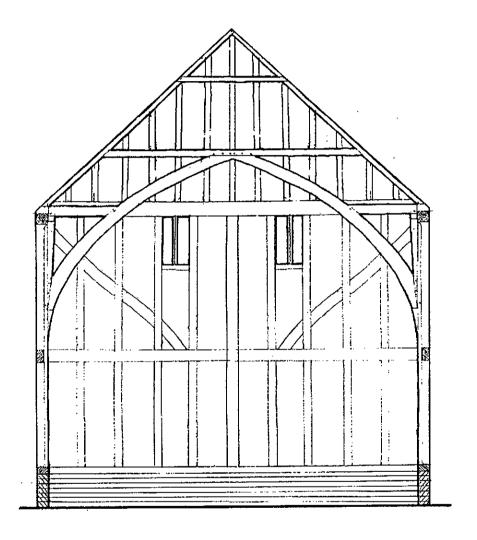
Sketch cross sectional view of building showing form of central cross frame and framing pattern of north wall. Not to scale.
